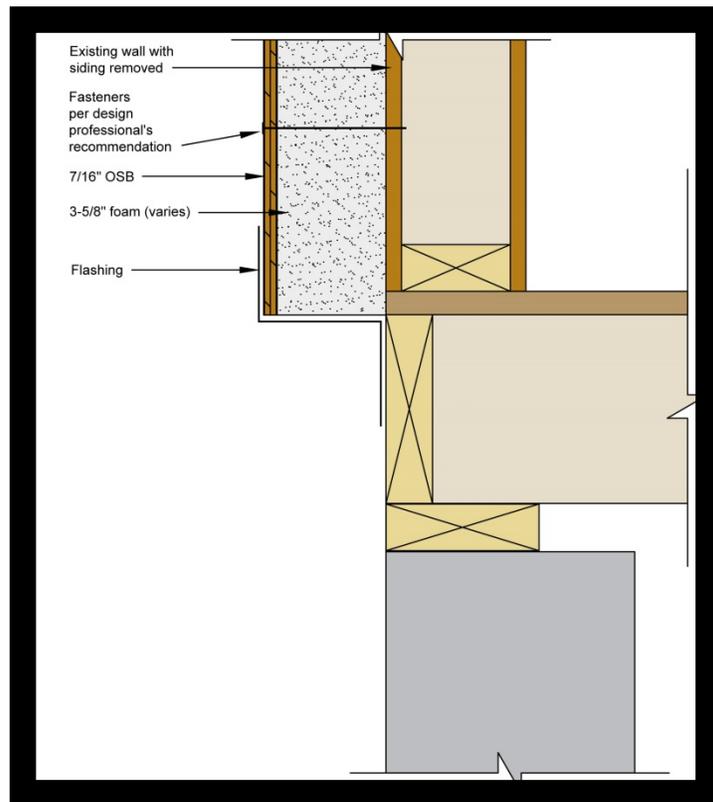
Alternate Retrofit Insulated Panel Rim Joist Detail
